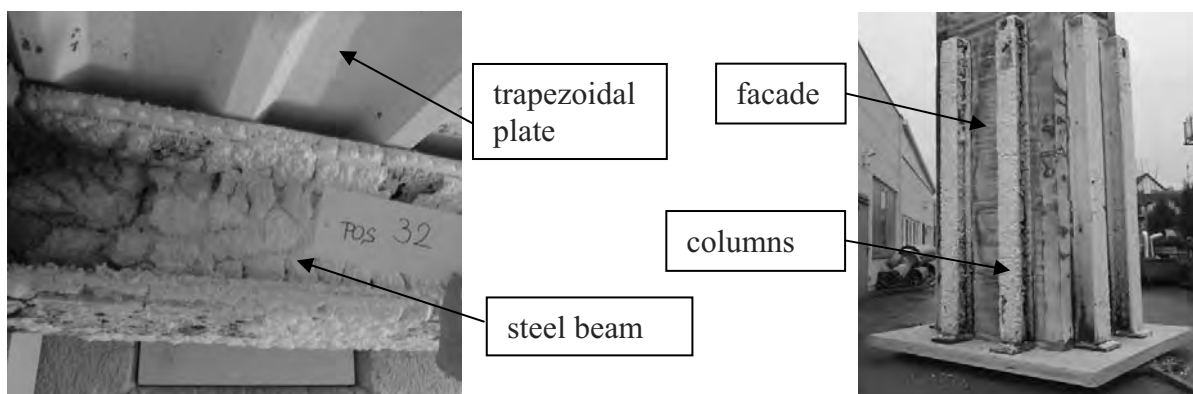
Loaded Beam with IC and trapezoidal plate after test
